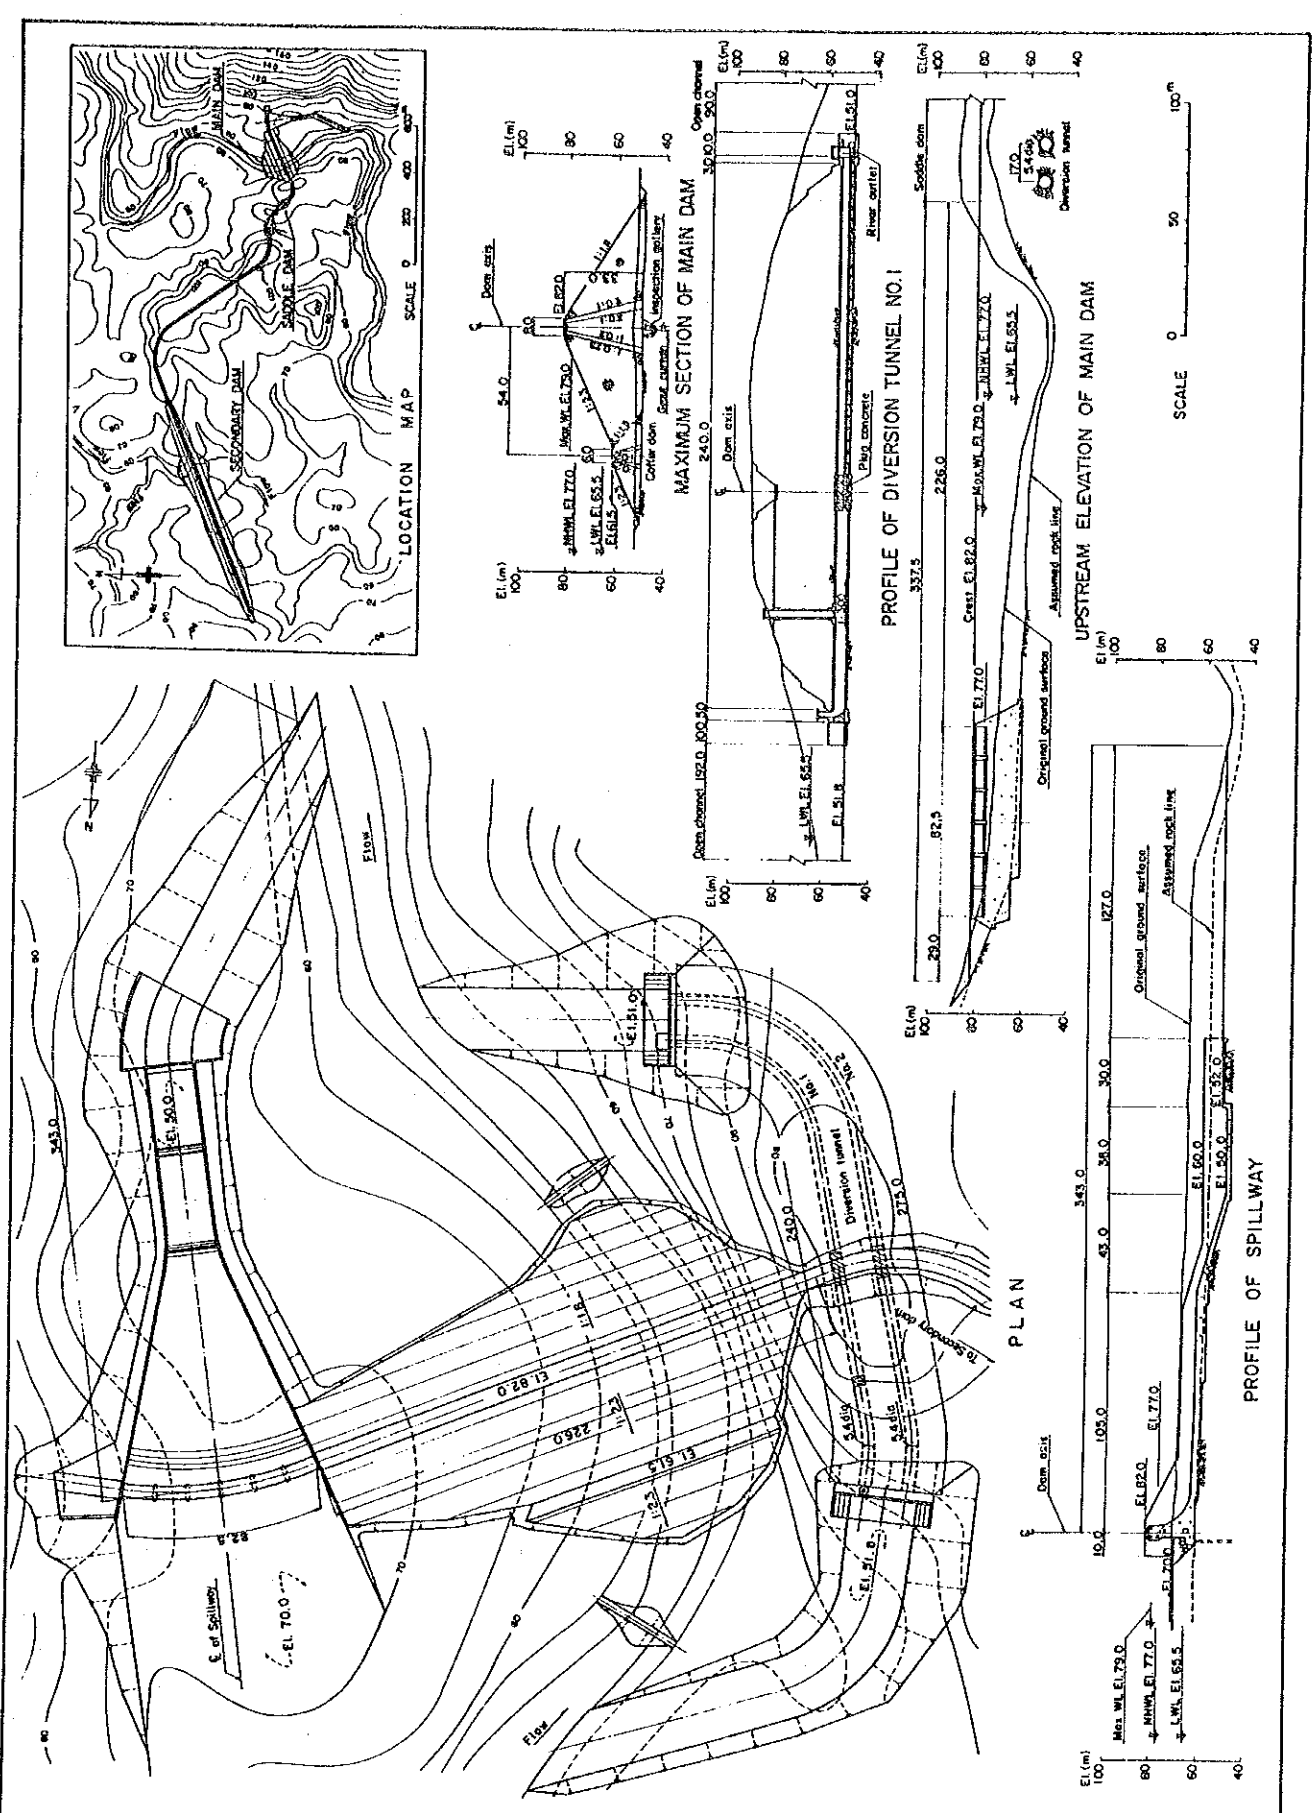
Plan, Elevation, Profile and Section of Tawar-Muda Dam (1/2)
